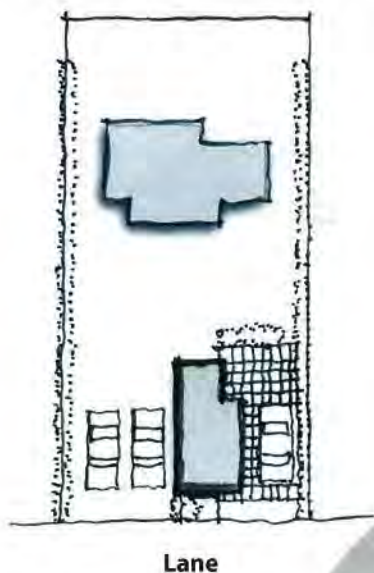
Dedicated coach house parking separate from parking for principal dwelling
